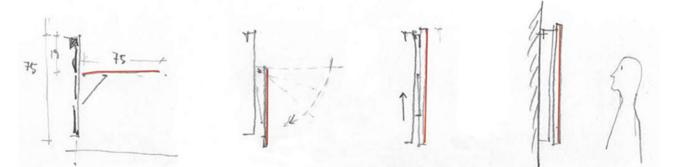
The Ribalta in its two locations: positioned in the balcony and hanging on a wall. Drawing by Arch. Edoardo Turozzi.
